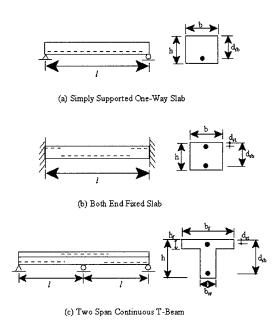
Sketch for dimensions of one-way slabs and t-beams
